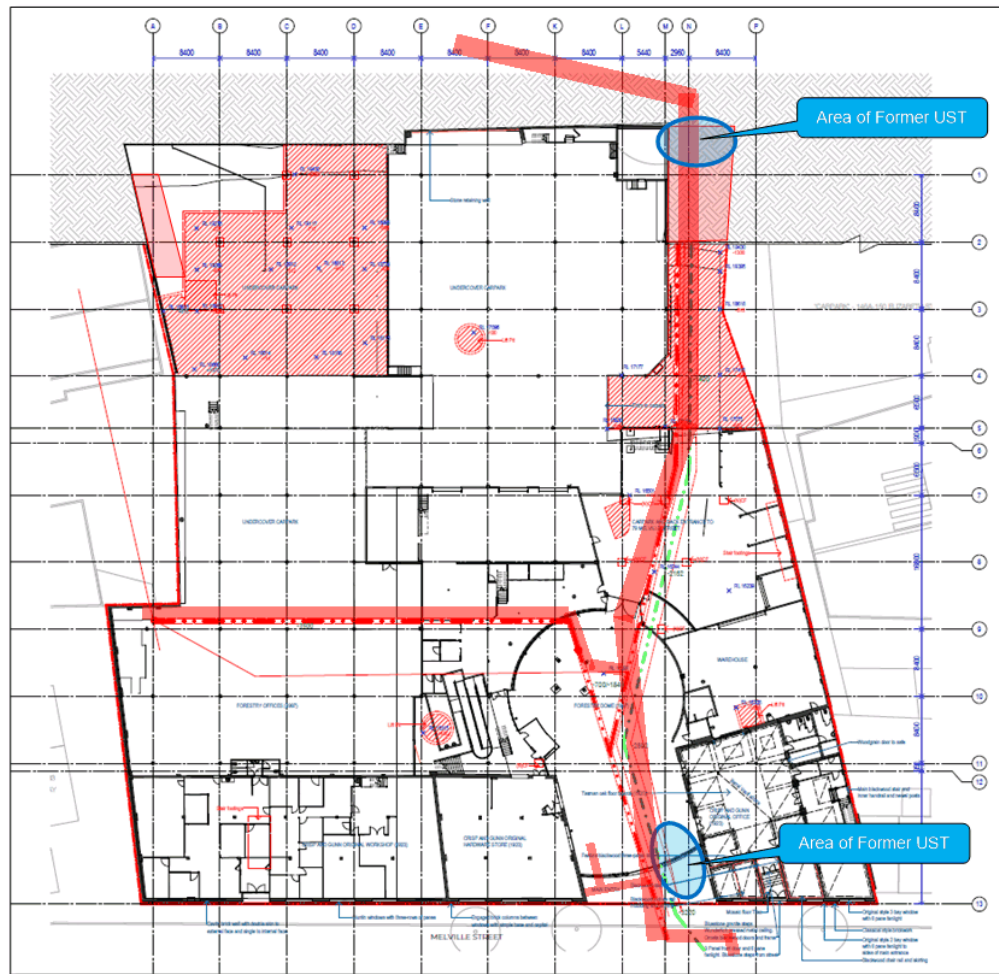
Site development footprint (red shaded areas = proposed excavation areas and utility trenches)
